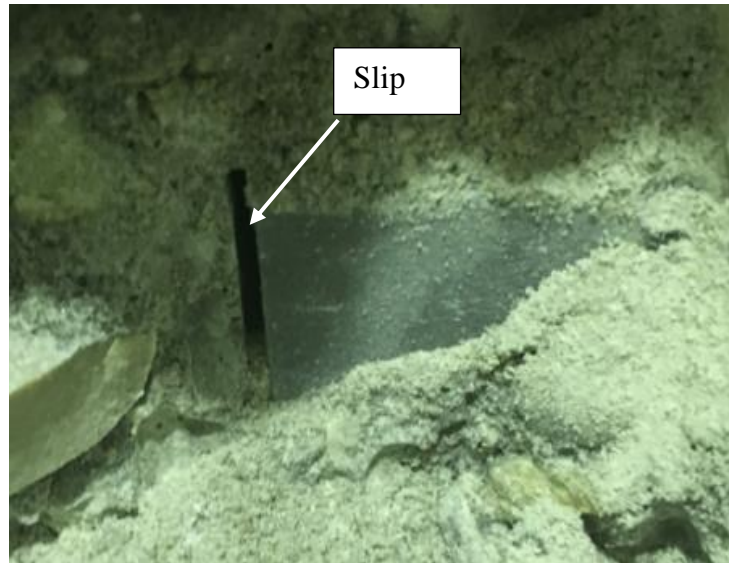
End Slip of Longitudinal Reinforcement Following Concrete Removal for Specimen 19■-510↑
